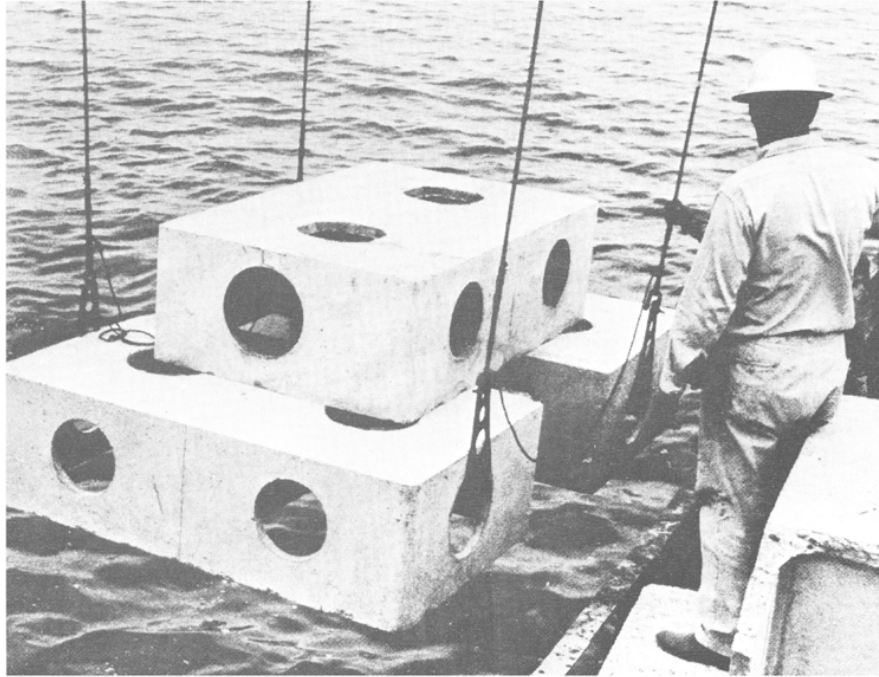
Pyramided concrete shelters being lowered to the sea floor.
